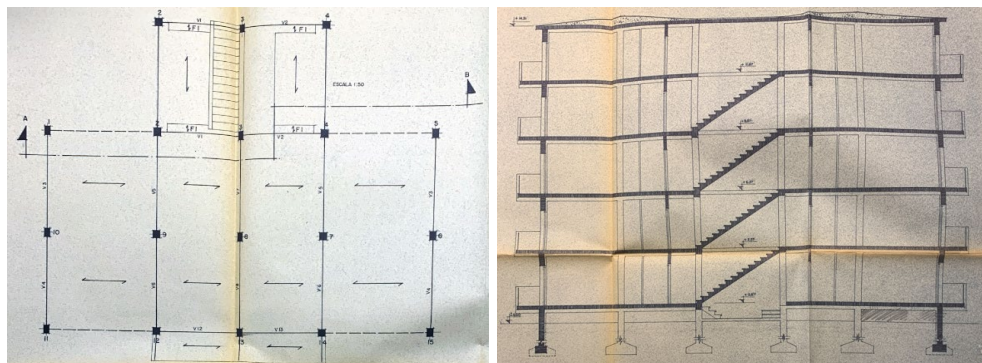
Typical unit plan view and lateral cross section, original drawings, Municipal Archive of Málaga
